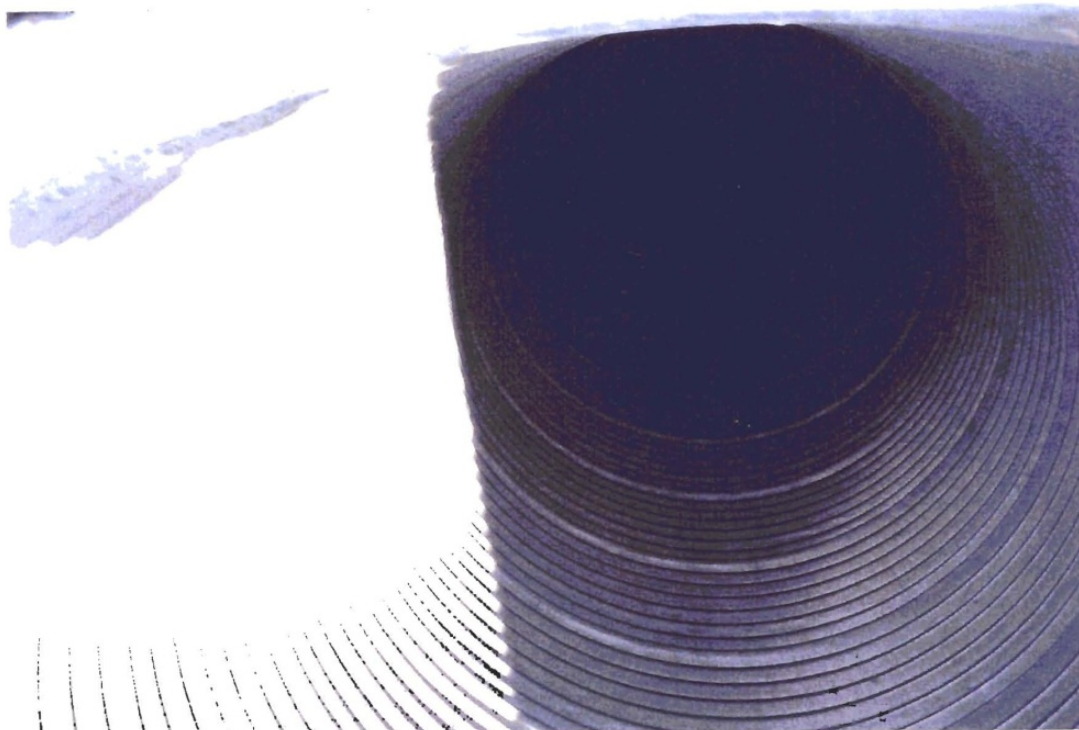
Internal View – Galvanized Steel Conduit, Storage Shaft 145
